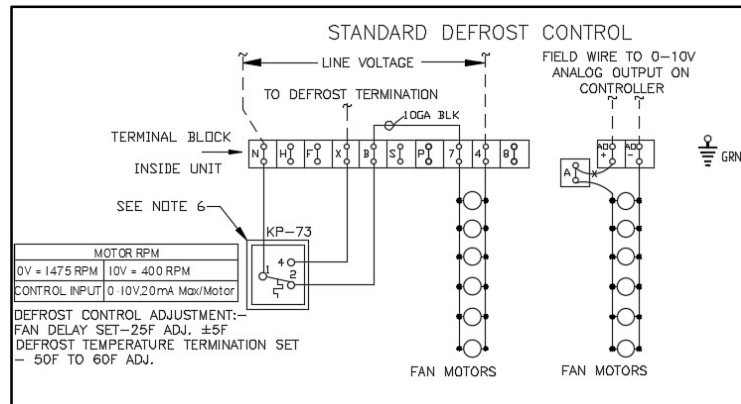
DUAL SPEED MOTOR EVAPORATER COILS – (MOTORS WITH CONTROL HARNESS)
